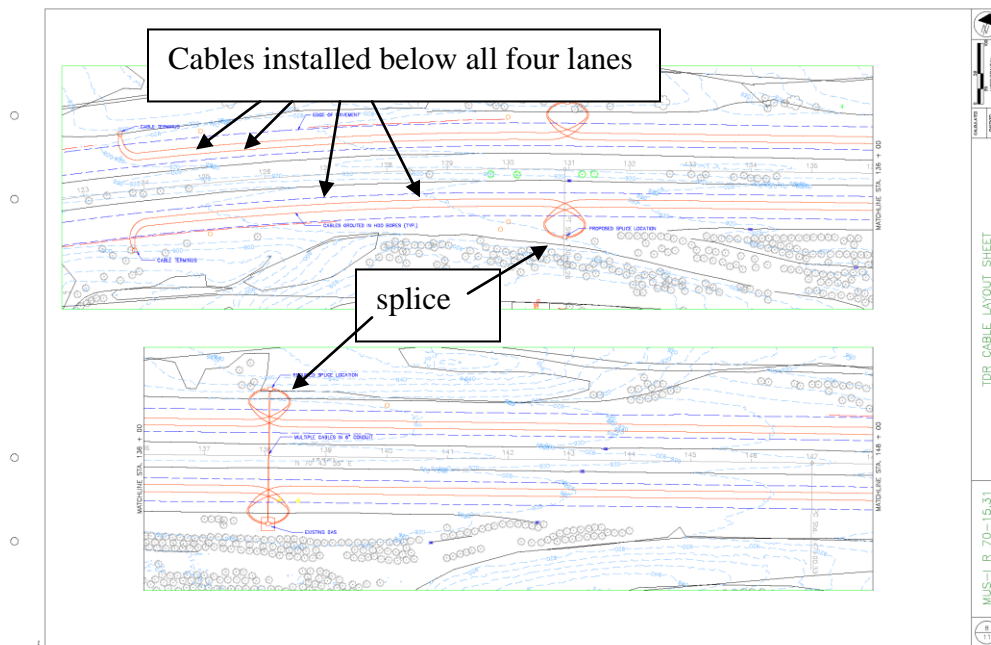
Cables were pulled into HDD holes and runs were spliced together
